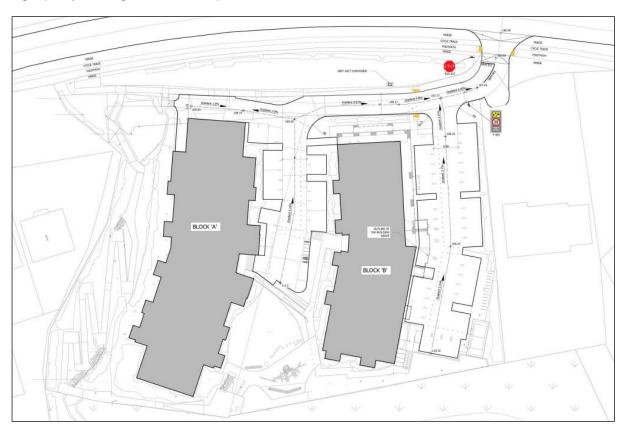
Site plan of the development granted under ABP Ref. 311669.
